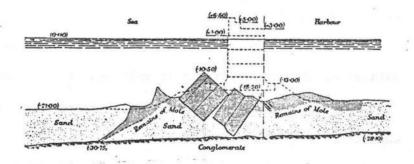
Sections Showing Failure of Eastern Breakwater at Catania
